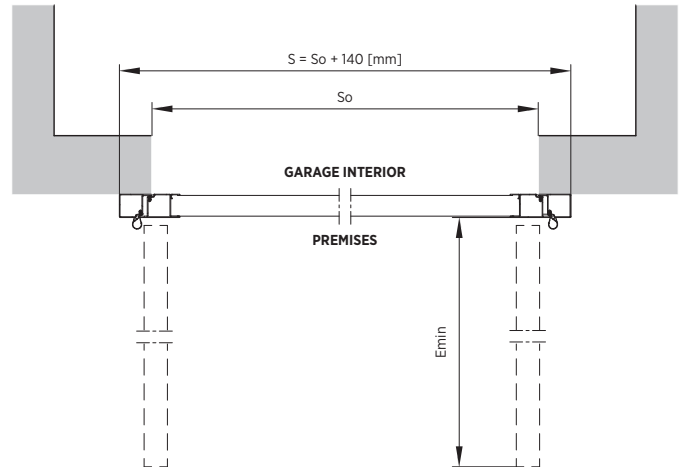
Installation in front of the opening – horizontal cross-section – Presto 50 double-leaf door.
